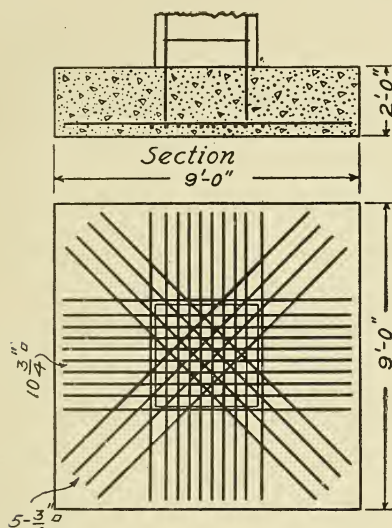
Detail of Column Footing, Mershon Building, Philadelphia, Pa.
